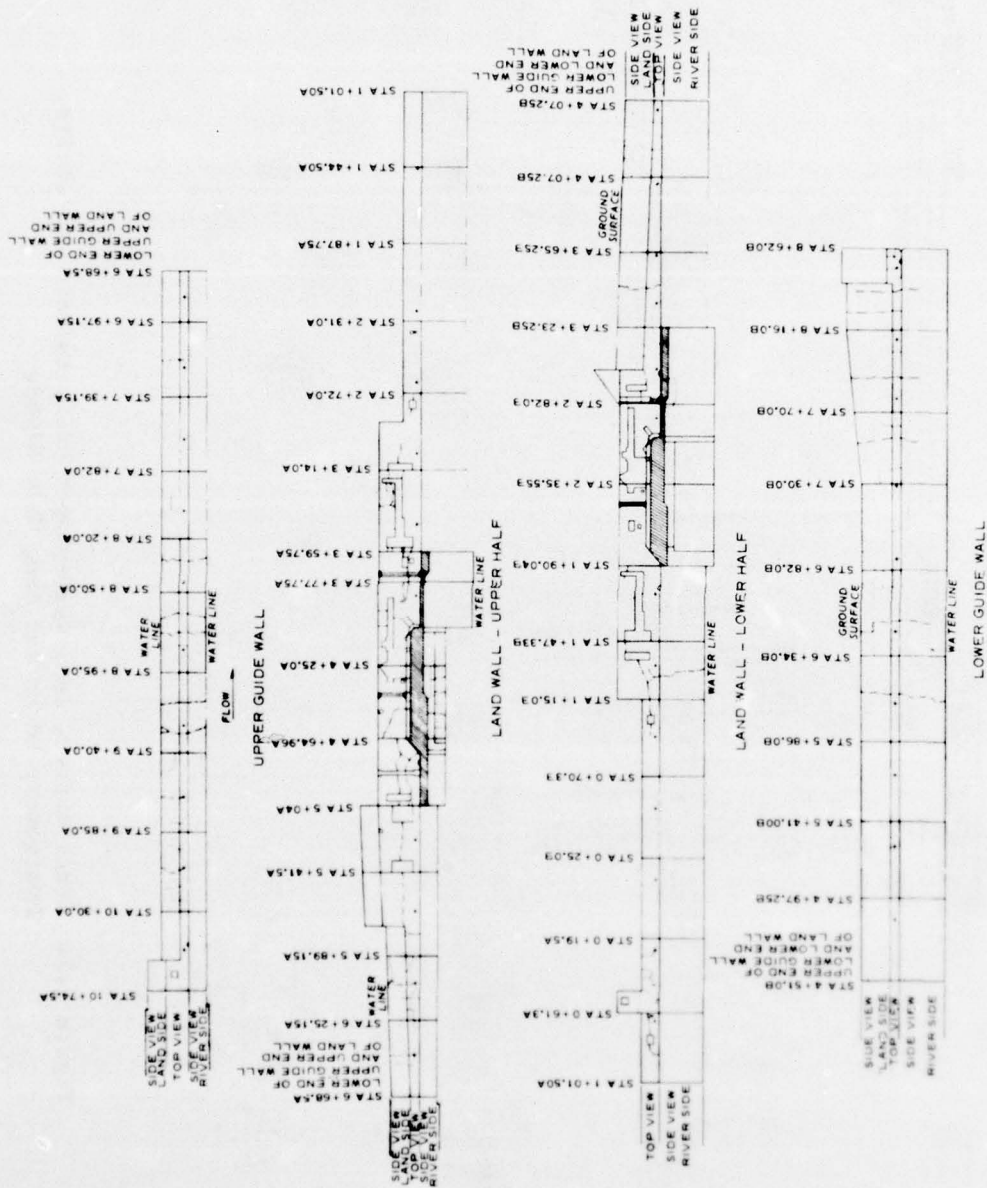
Crack survey, land and guide walls, Montgomery Locks and Dam, Ohio River.
